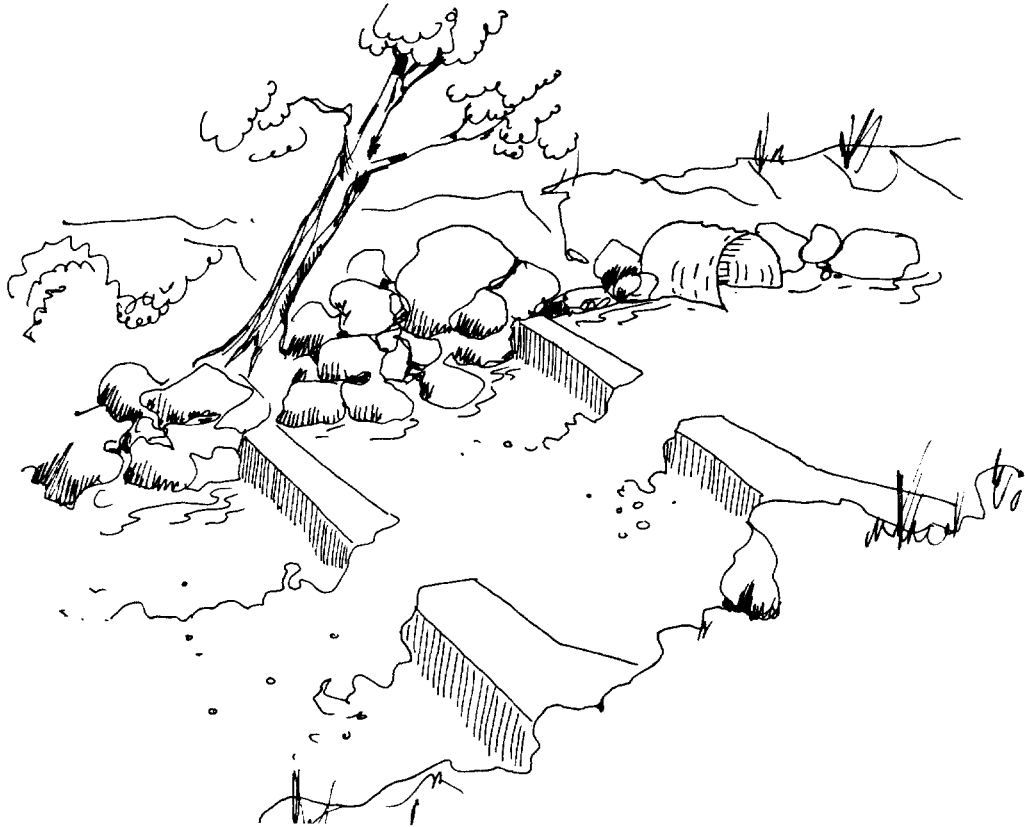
Gabion or concrete sills can raise tailwater elevation to facilitate fish entry into the culvert; this weir construction was used to improve fish passage at the mouth of Gold Creek (after Evans and Johnston 1974).
